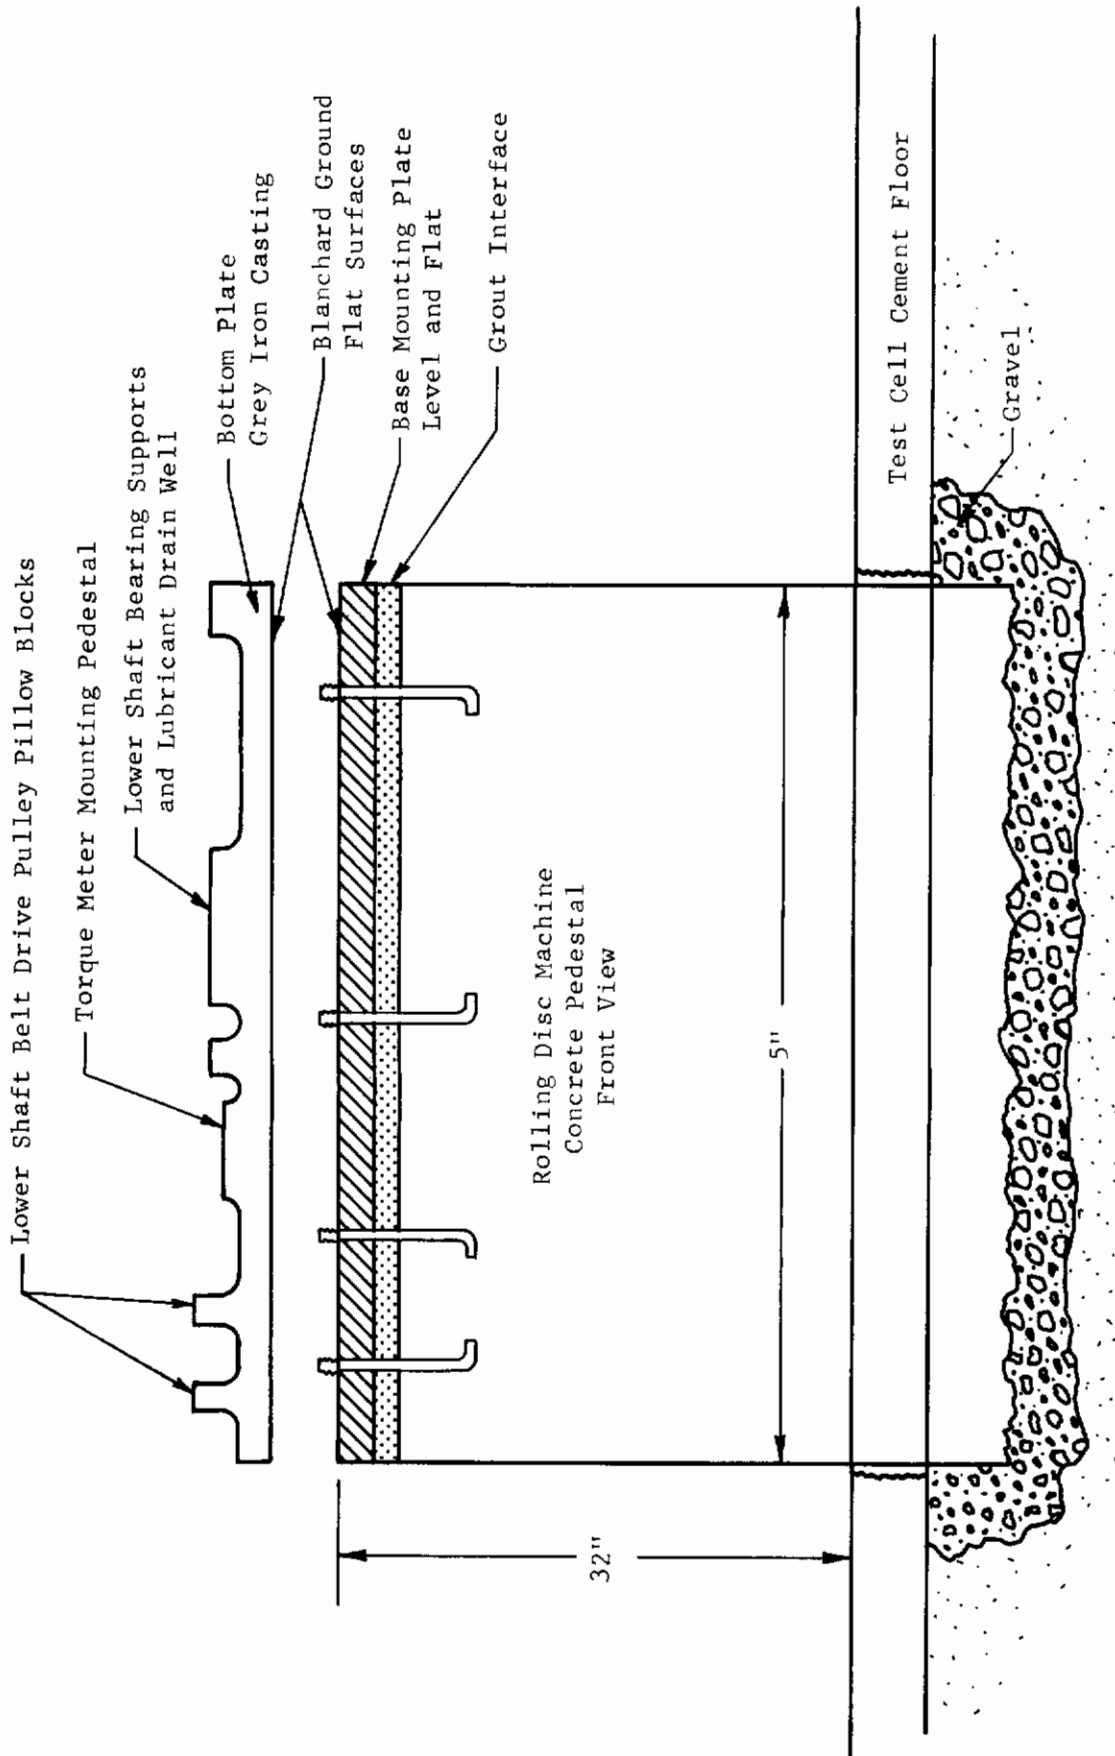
Front View of Rolling Disc Machine Base Pedestal Assembly
